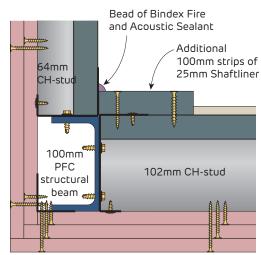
Detail using PFC Beam with 64 and 102mm CH-Studs
